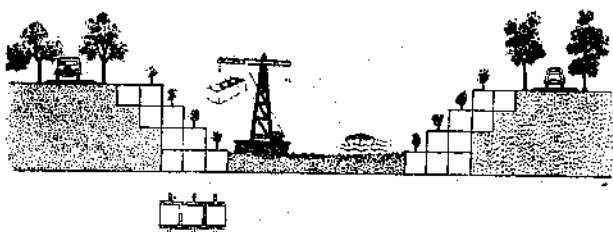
& 3 concrete T-plates and hollow blocks to stabilise the terraced embankments
